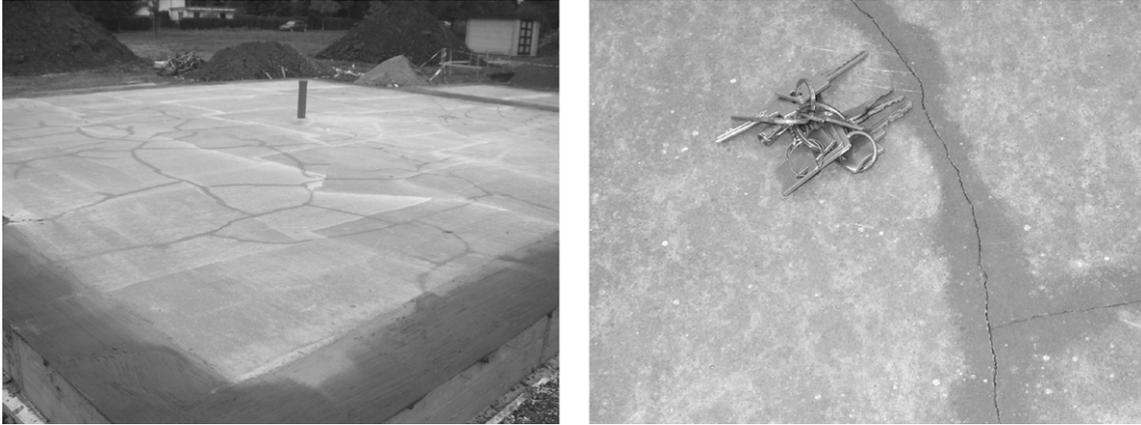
Cracks in a concrete slab caused by capillary shrinkage
